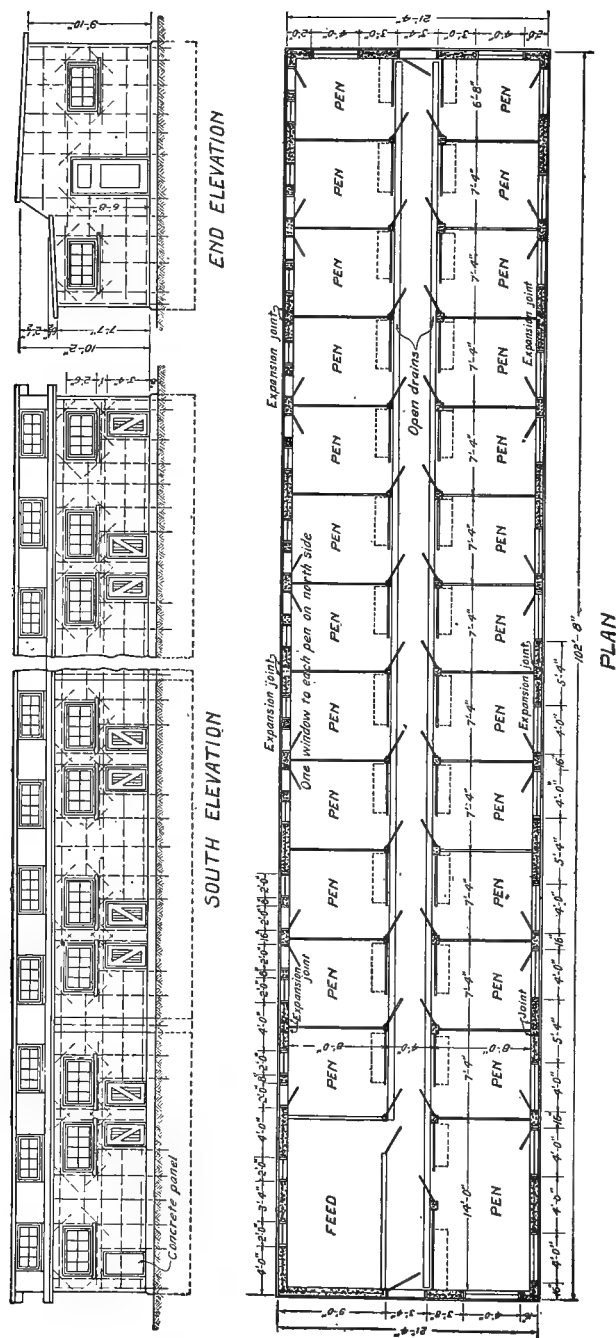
Plan of a Reinforced Concrete Hog House, having 25 Pens and a Feed Room. When desired, concrete blocks may be substituted for monolithic walls, all of the dimensions being convenient for block construction.
